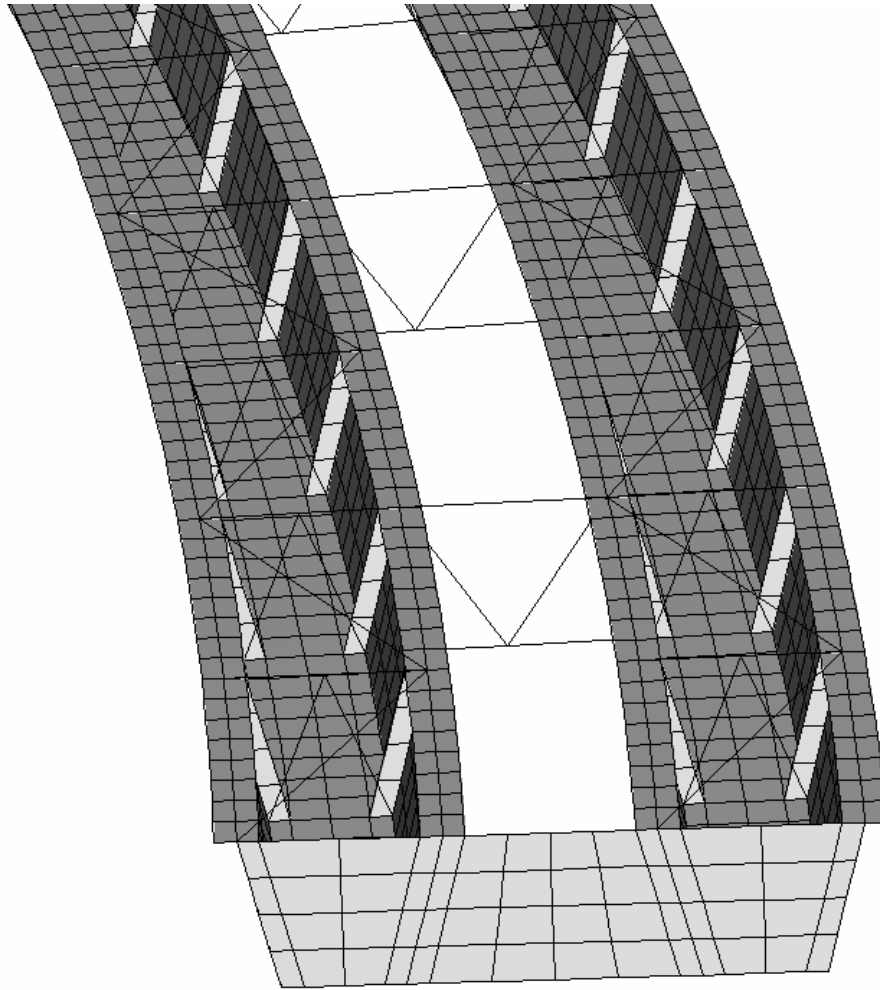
FINITE ELEMENT MODEL FOR BRIDGE CONNECT K
